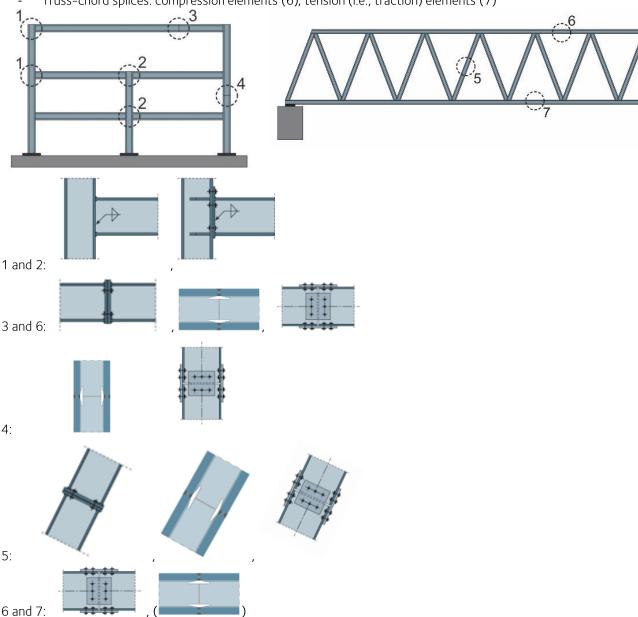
Types of connections in structures and recommended connections types in structures.
